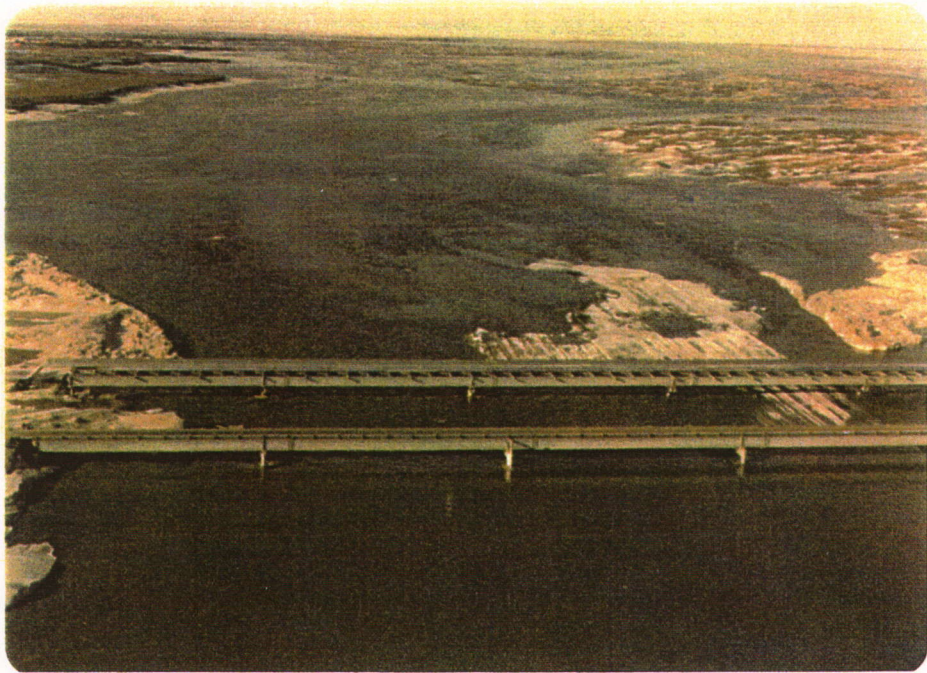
MULTI-SPAN PIPELINE BRIDGE
